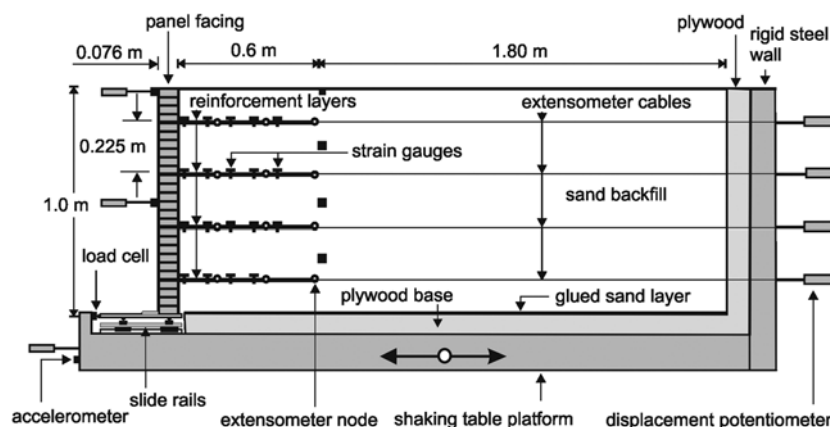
Schematic diagram of 1/6-scale shaking table model wall and instrumentation
